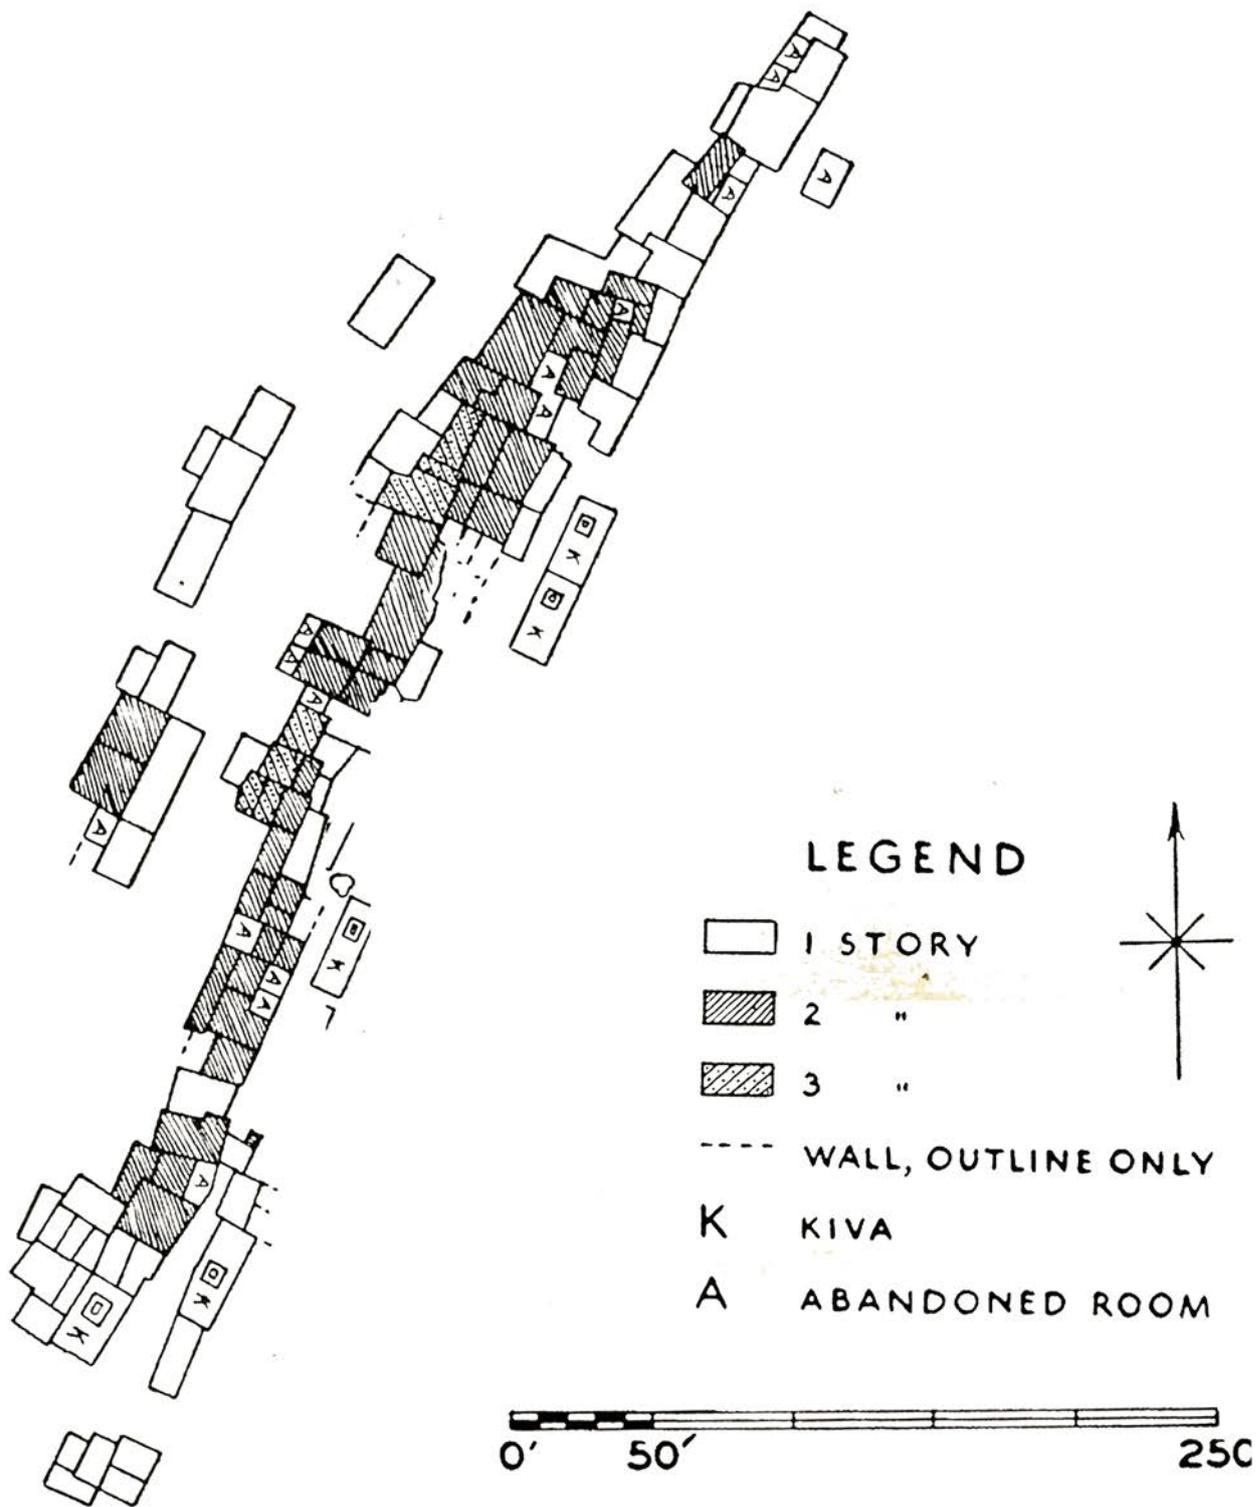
Walpi floor plan, 1950. Planta de Walpi, 1950.
